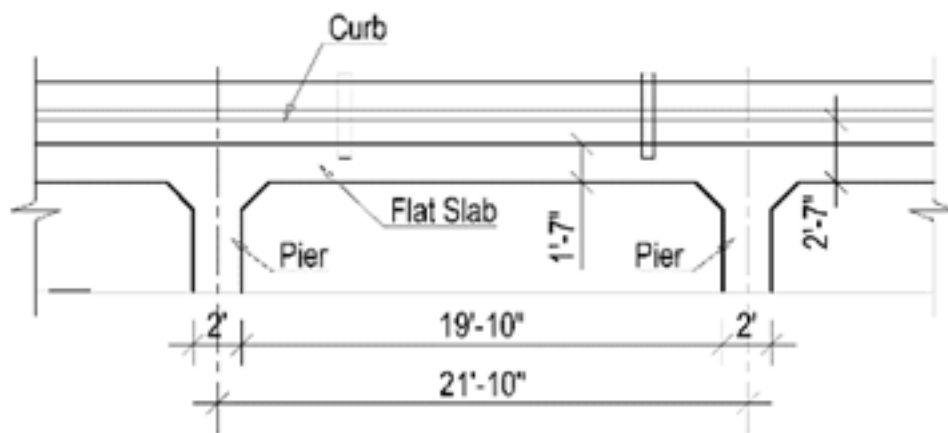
Elevation of Typical Span of Barnes Slough Bridge
